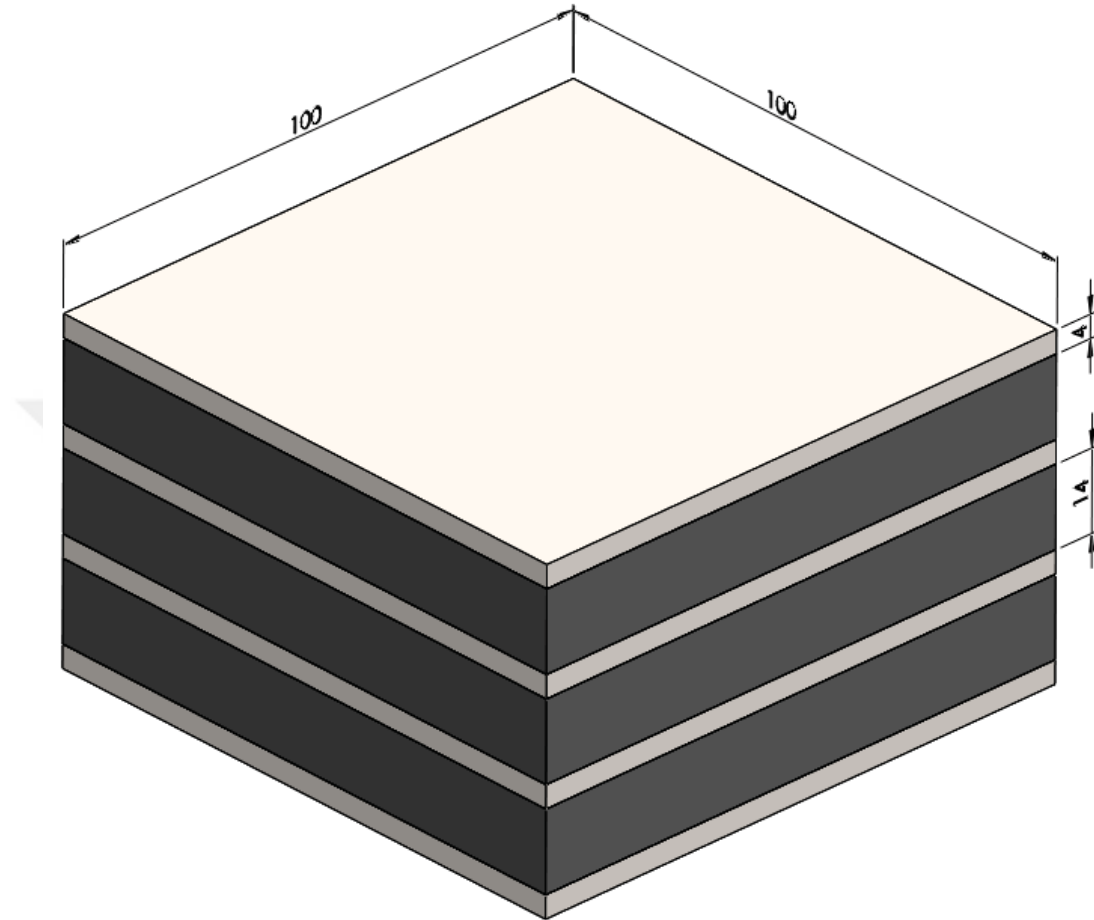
3D model and dimensions (mm) of the bearing sample model
